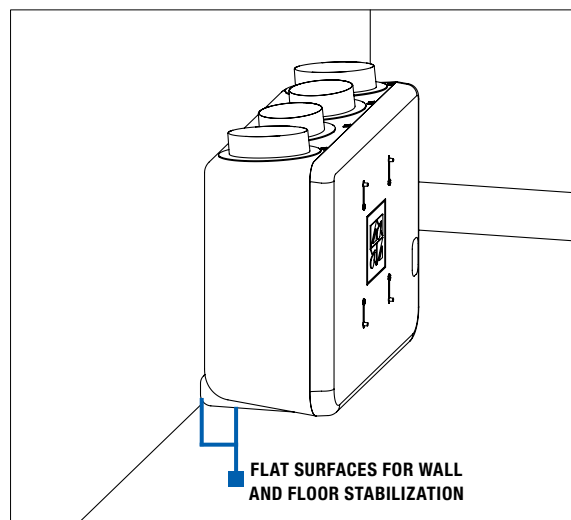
FLOOR MOUNT DETAIL
